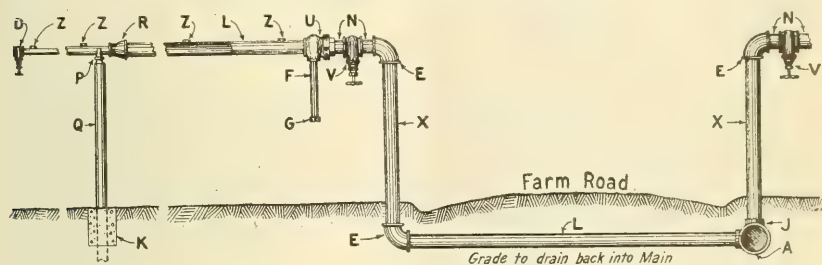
Sketch showing typical fittings for overhead nozzle lines connected to main feed pipe and method of crossing a farm road. A, Main feed pipe; D, drain cock or cap; E, elbow; F, handle for turning nozzle lines; G, cap on handle; J, side-outlet tee; K, concrete base for pipe post; L, nozzle-line pipe; N, "long" nipples; P, pipe hanger; Q, 1½-inch pipe post; R, reducing cocket; U, turning union; V, brass gate valve; X, risers to nozzle lines; Z, nozzles.
